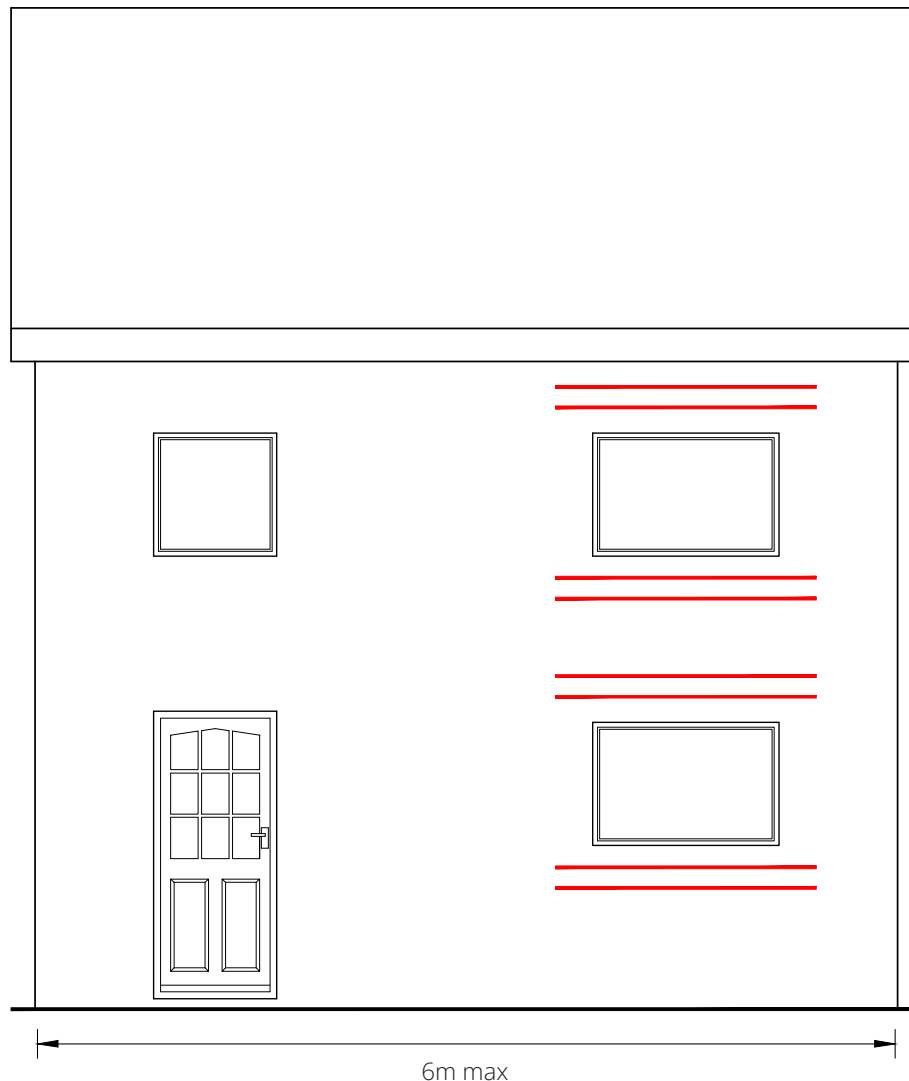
Example of reinforcement above and below openings exceeded 1.5m
